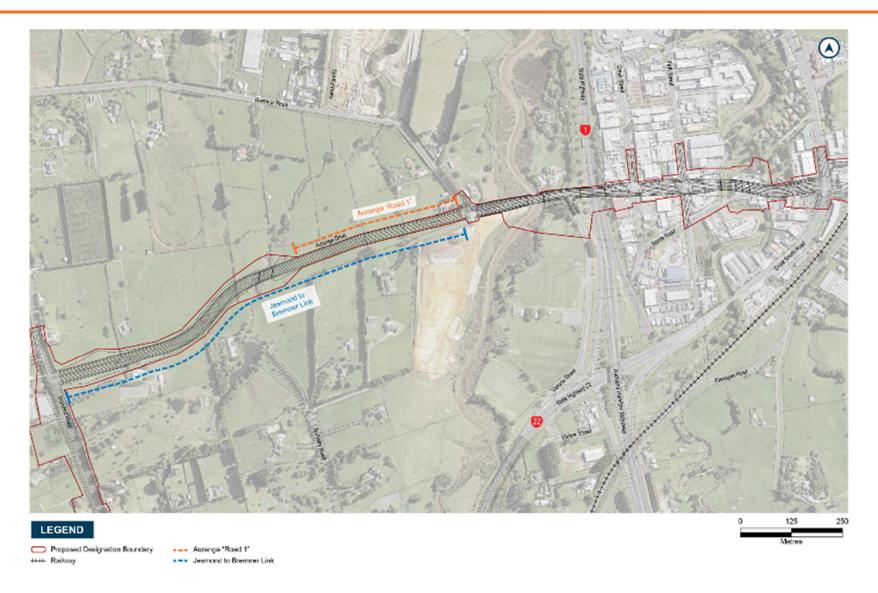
Overview of Bremner Road FTN Upgrade Section
